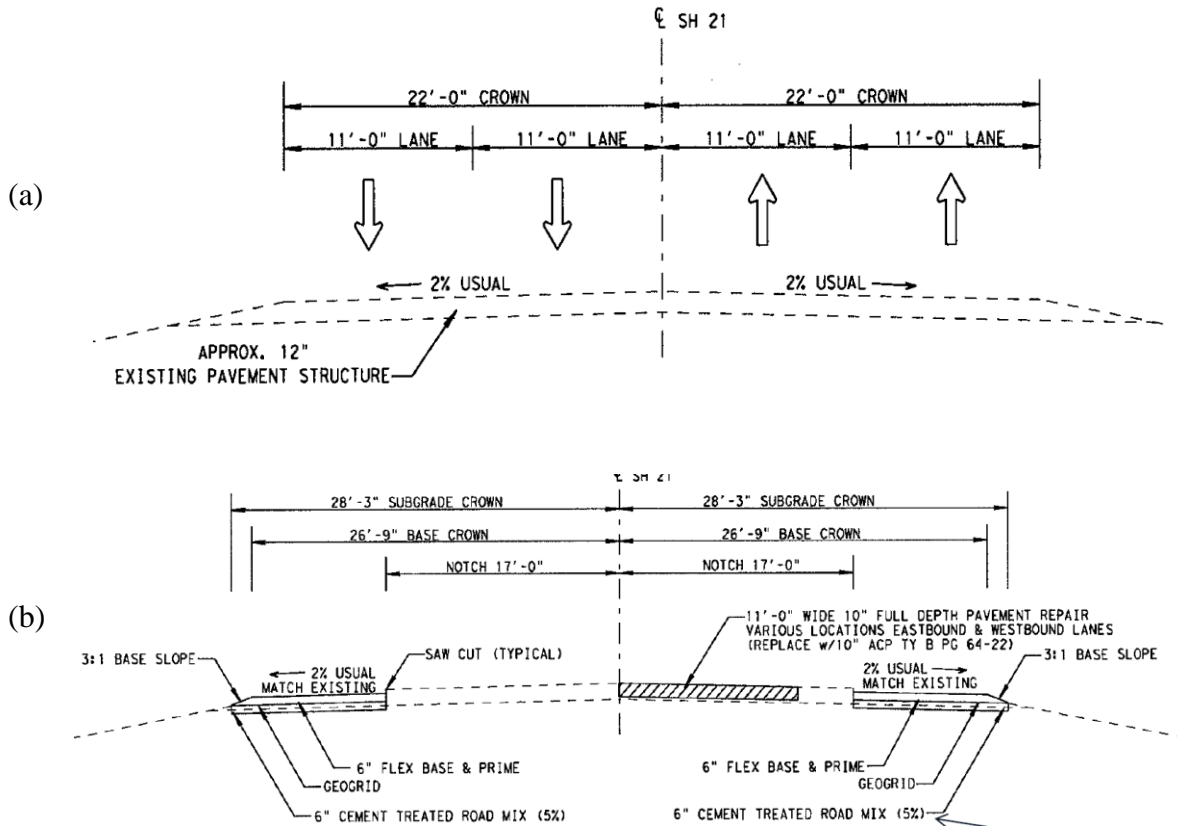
Test sections design in the SH21 reconstruction project: a) before reconstruction; b) after reconstruction
